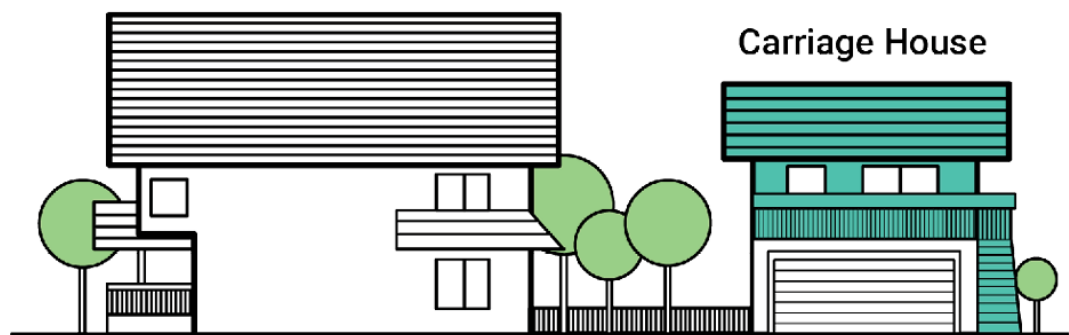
For example, a Single-Detached Dwelling and a Carriage House is permitted on a lot 4 ha or greater. Strata titling of the Carriage House is not permitted.
